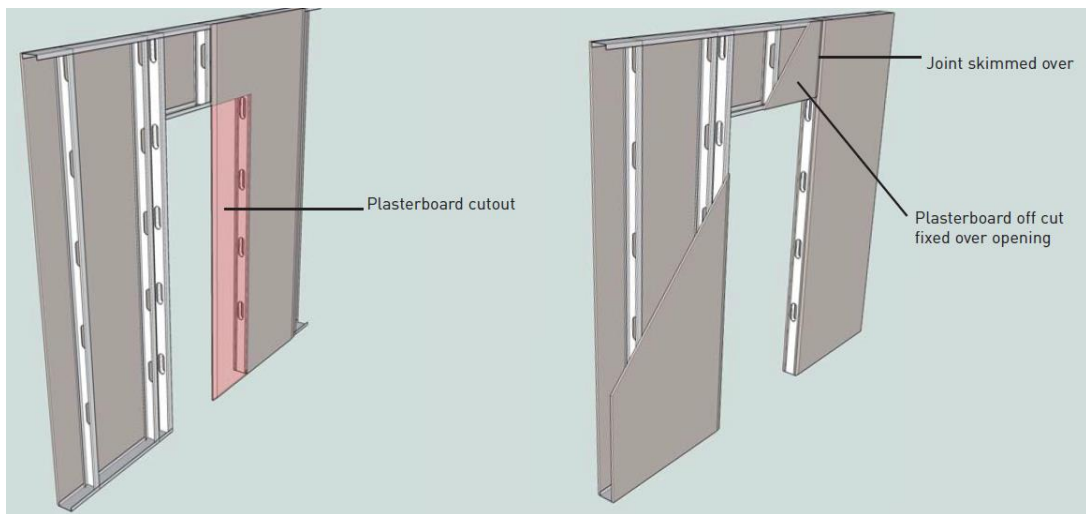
Low waste door jamb (Source: WRAP UK)
